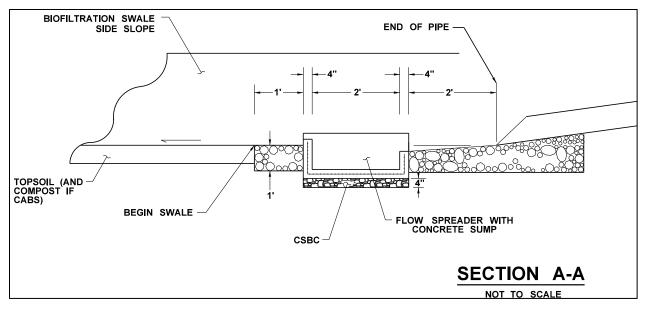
Biofiltration swale: Concrete flow spreader details.
